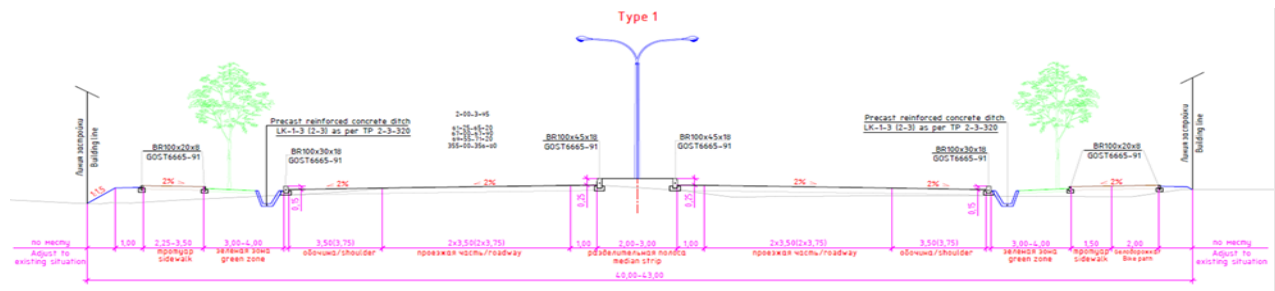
Typical cross section in settlement with sidewalk and bicycle lane
